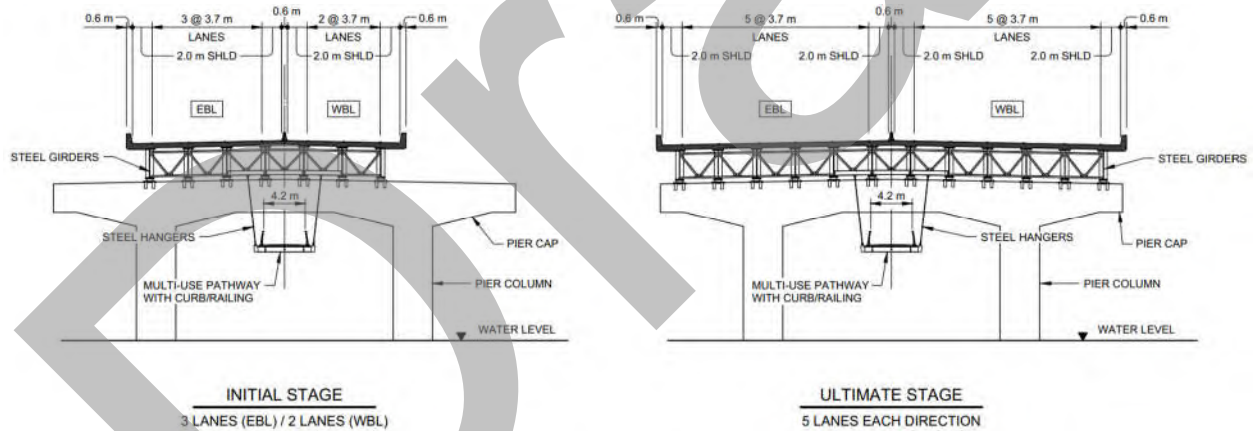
Typical initial and ultimate bridge cross sections (steel plate girder)
